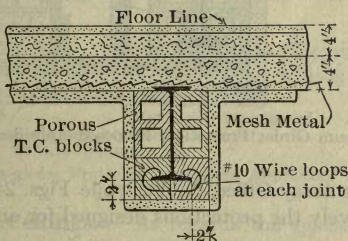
Concrete Floor Slabs with Terra-cotta Beam Casing, U. S. Assay Office, N. Y.
